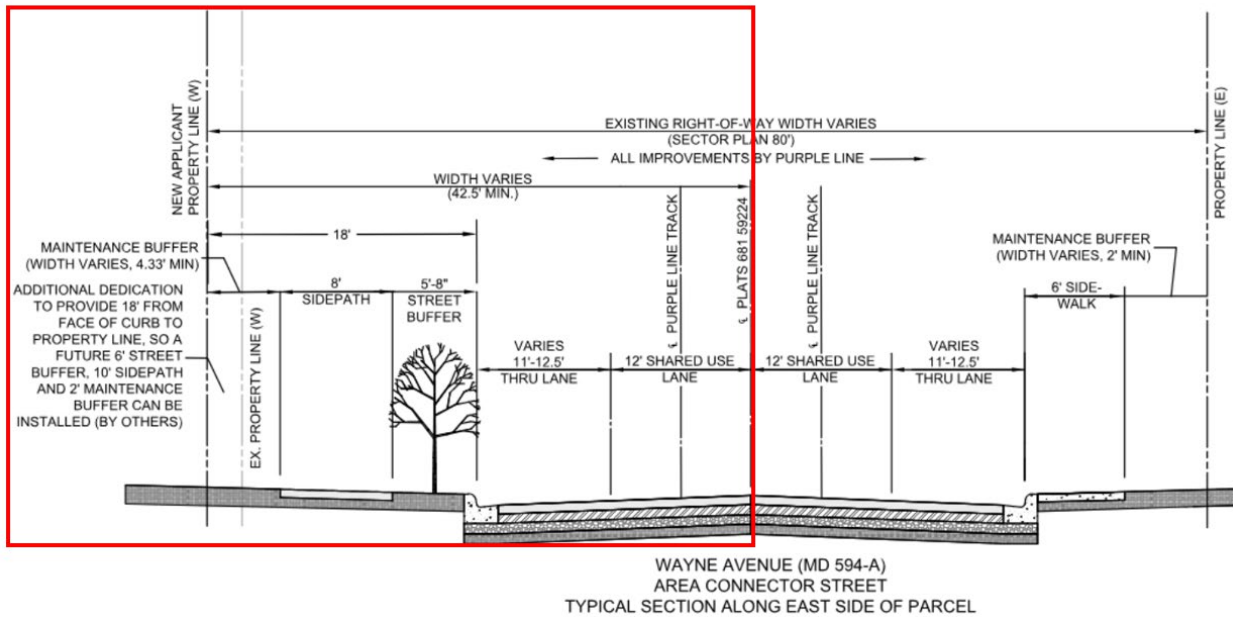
Wayne Avenue, looking north. Applicant contribution shown in red
